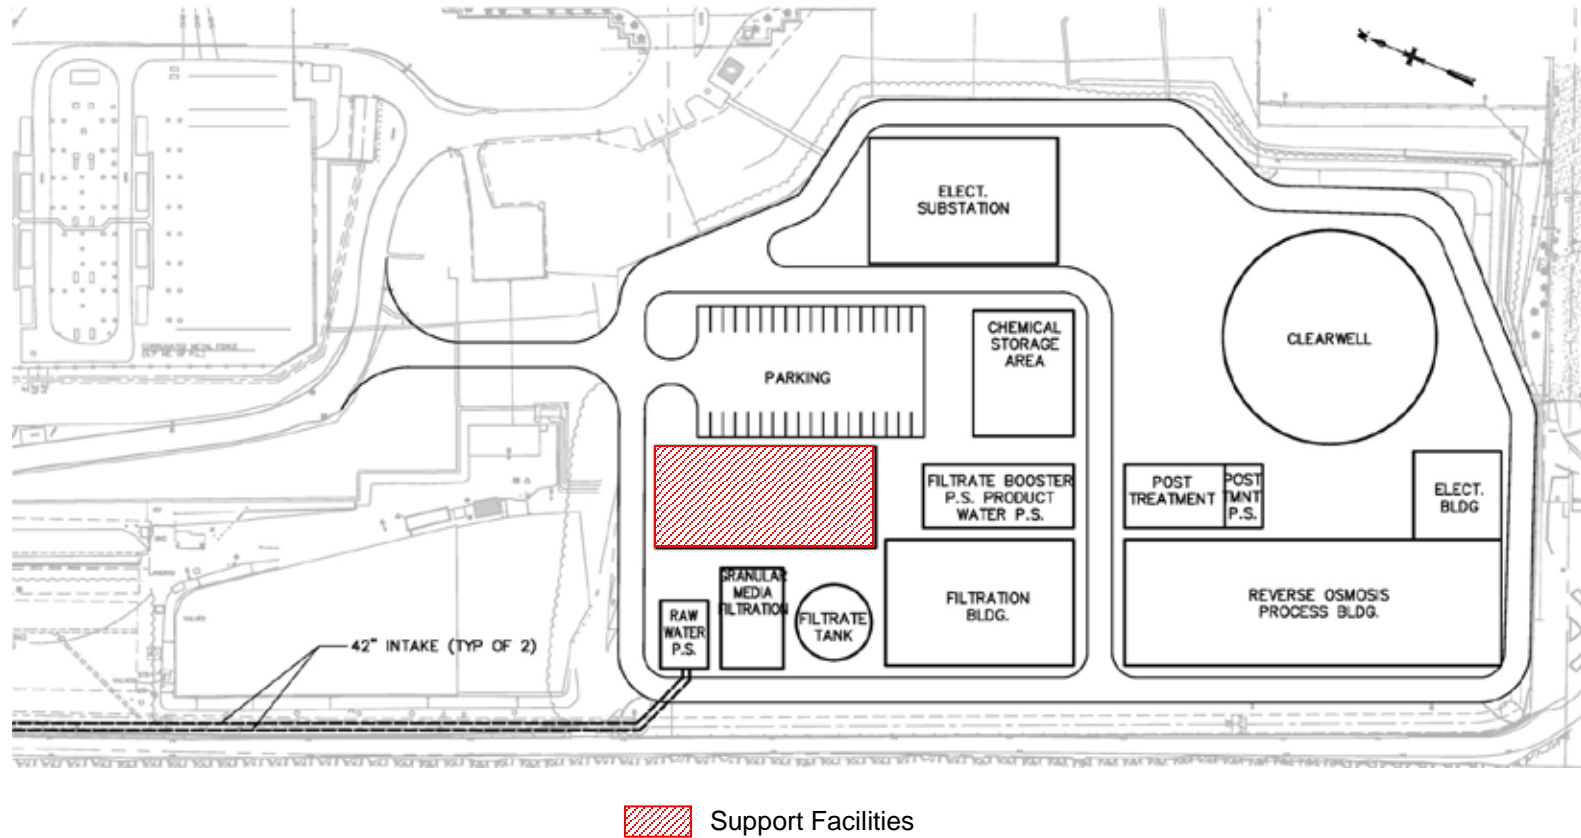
AES Preliminary Site Layout – 20 MGD Support Facilities
